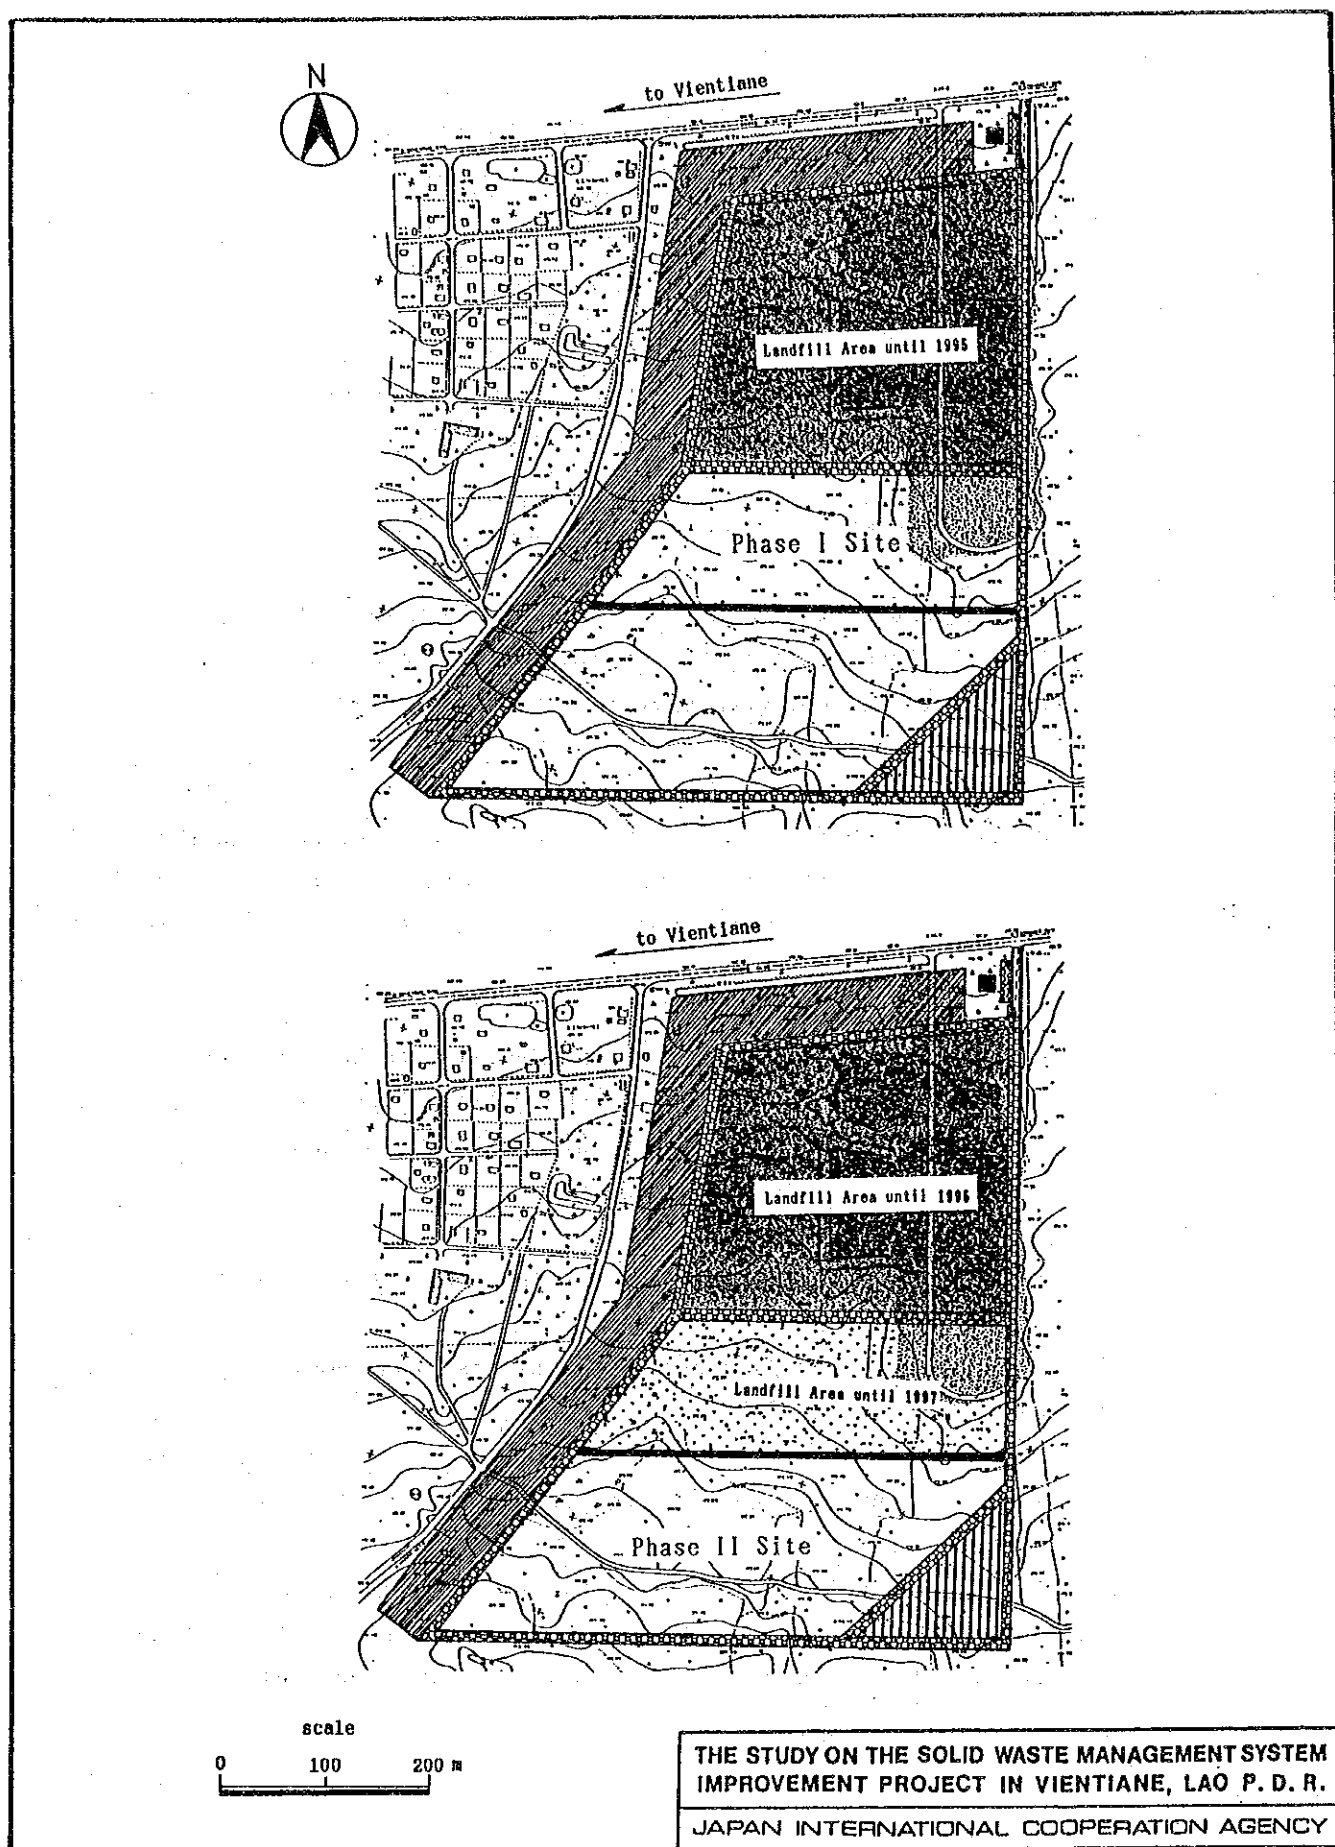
Staged Development Plan for KM 18-DS
